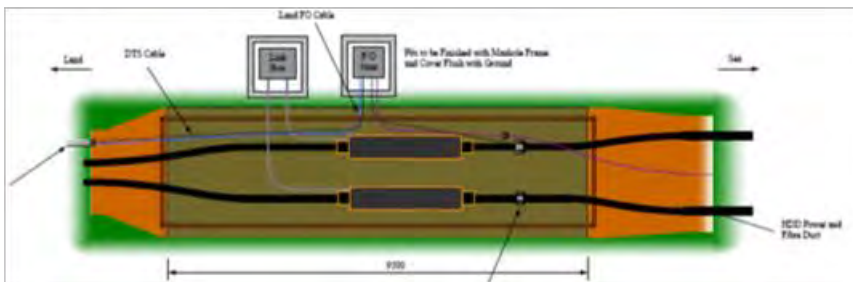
Typical transition joint bay lay-out for HVDC cable system comprising of 2 DC cables and a Fibre Optic (without MR cable)
